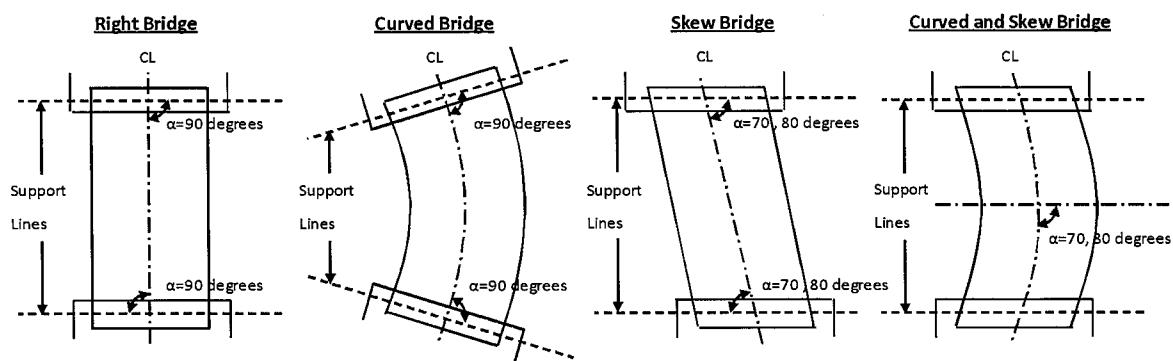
Applicable Planar Shapes and Skew Angles
